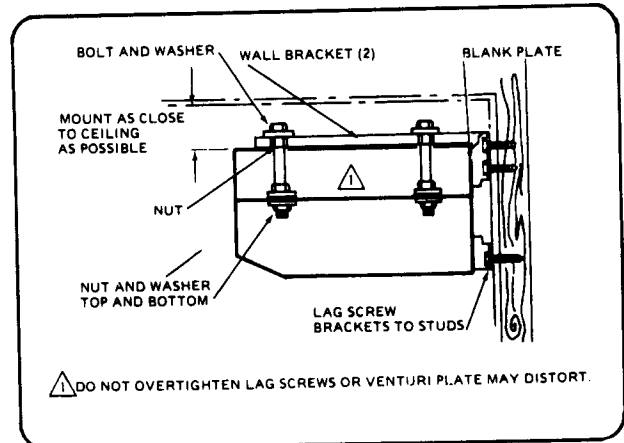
USE ACCESSORY MOUNTING BRACKETS TO MOUNT C-12 ON WALL.
